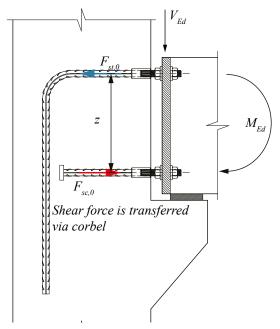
Structural behavior of anchoring couplers in beam-to-column connection.
